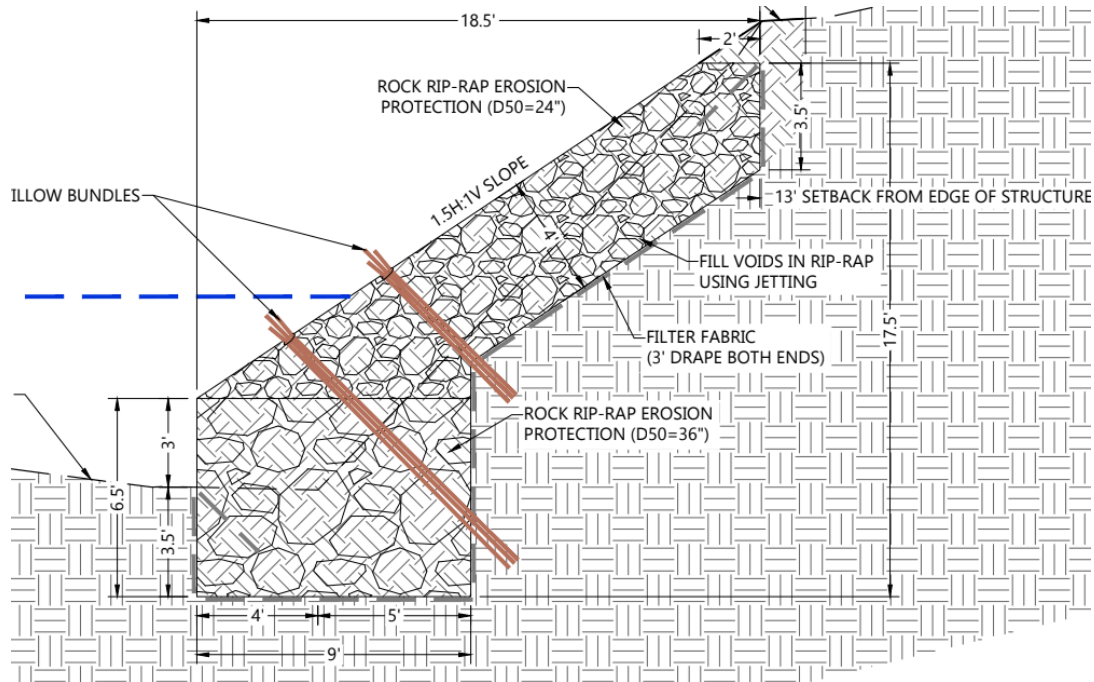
Diagram showing the extent of erosion protection proposed in plan
